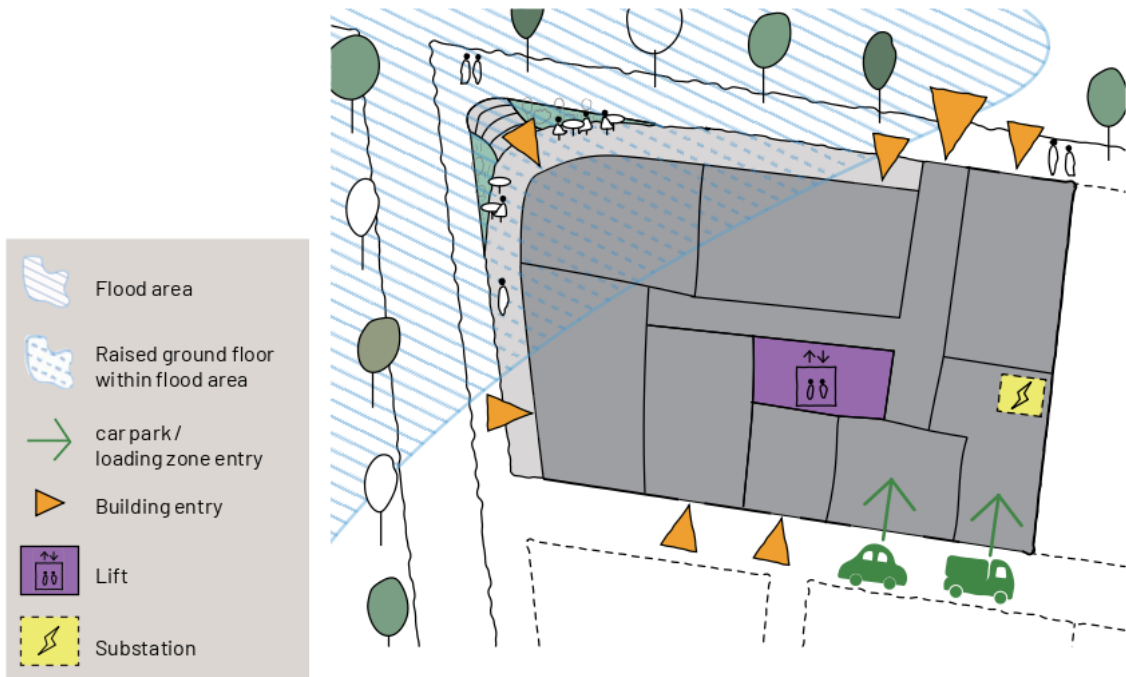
Building entrances are located above the flood line on natural ground and the elevated ground level via a colonnade with raised terrace. Access to car parking and loading zone is located outside of flood area at the rear of the property. The lift and substation are also located outside and above of flood area.
